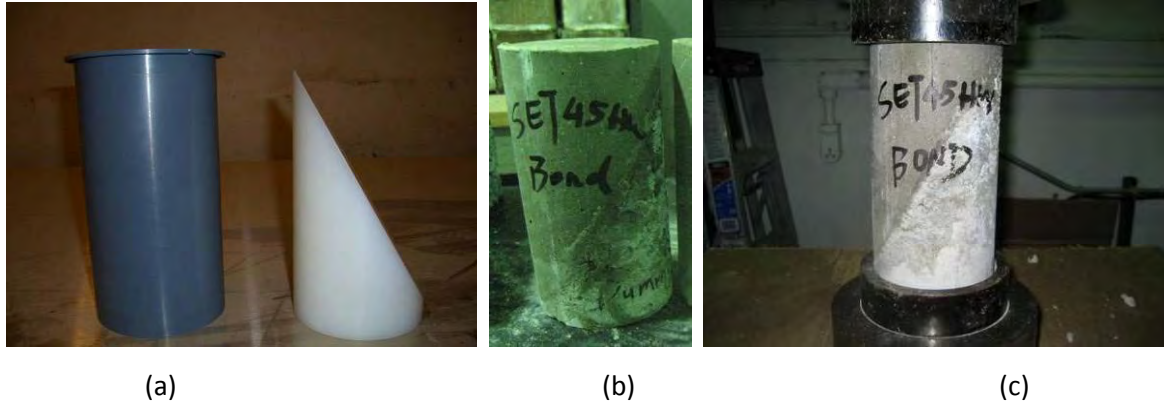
ASTM C882 Test: (a) Test mold and dummy section (b) Completed slant shear cylinders ready for testing (c) Test setup
